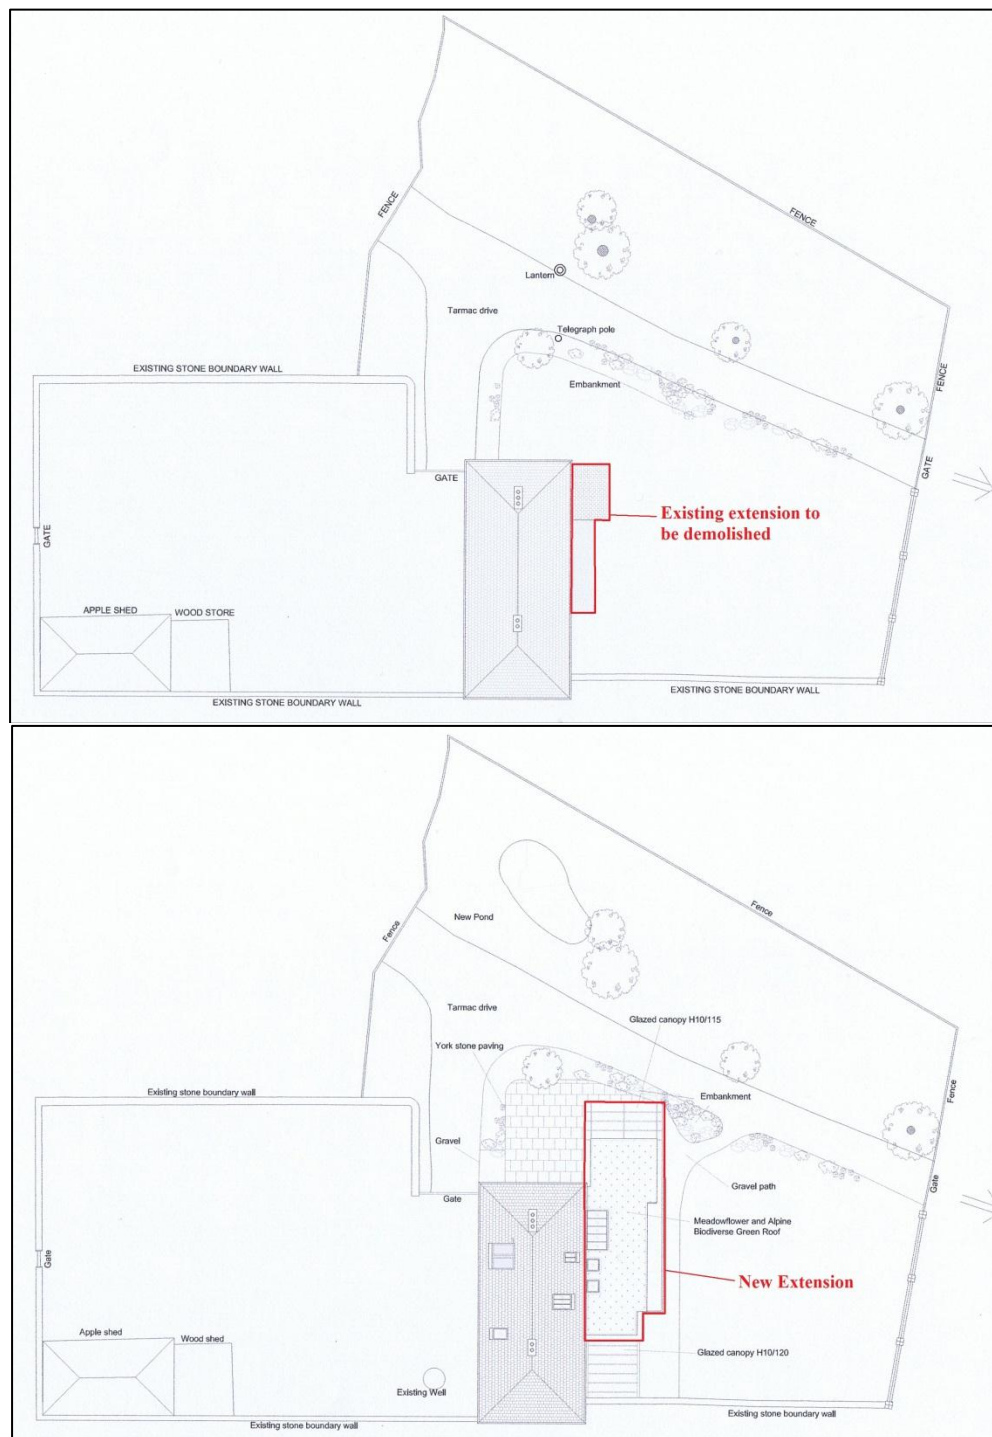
Ore Place Farmhouse: Site plans showing location of existing extension (above) and new extension (below) (adapted from architects plans)
